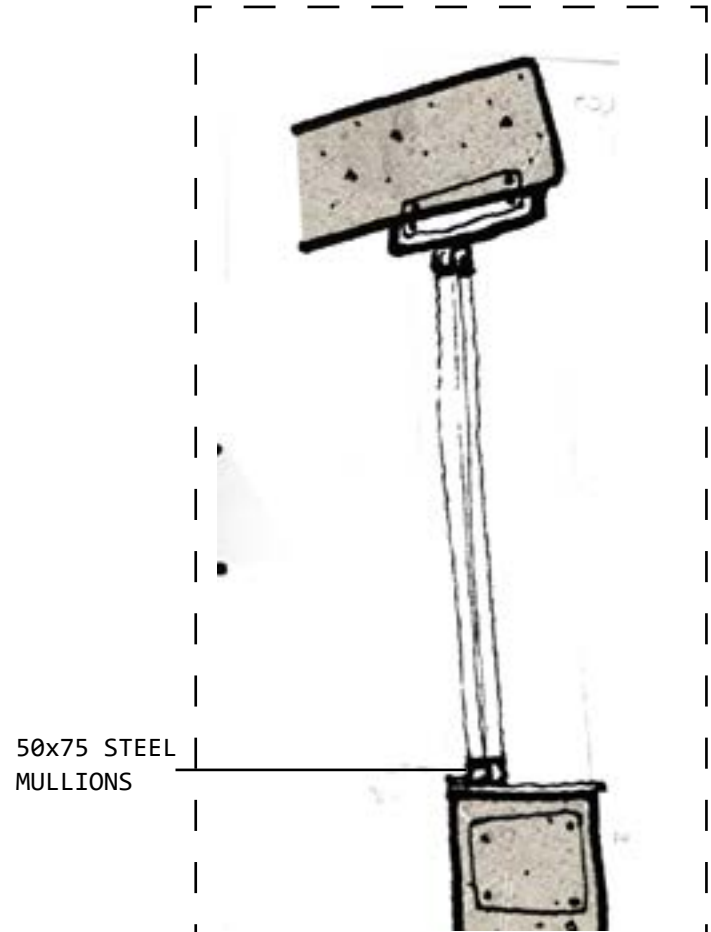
K: [DETAIL 4] Window detail (Author, 2021)
